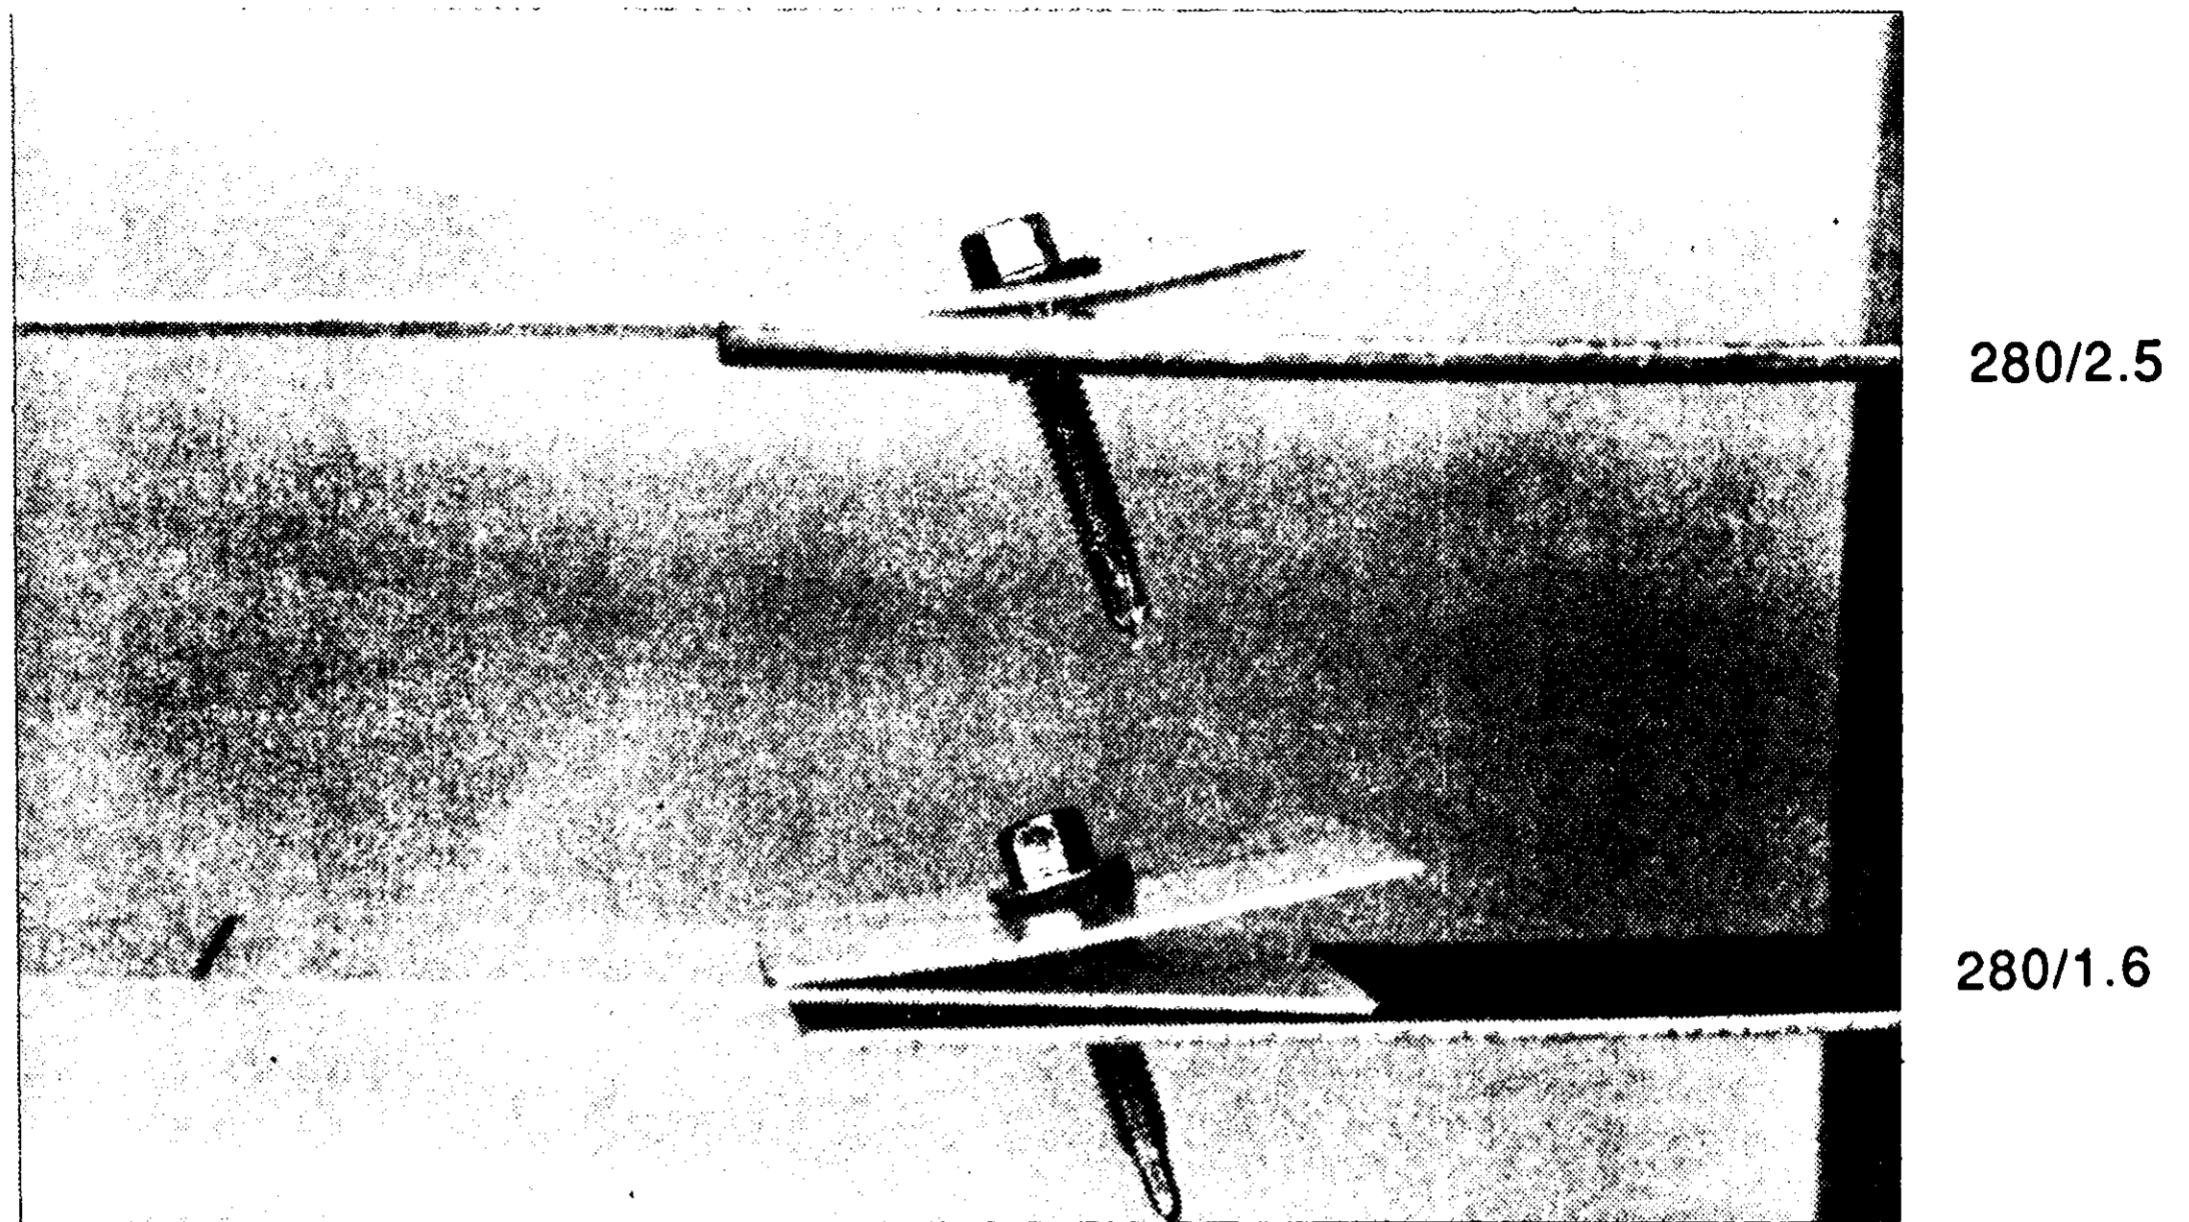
Sheet (0.55 mm)-to-purlin connections (12g neo) after pull-out tests.
